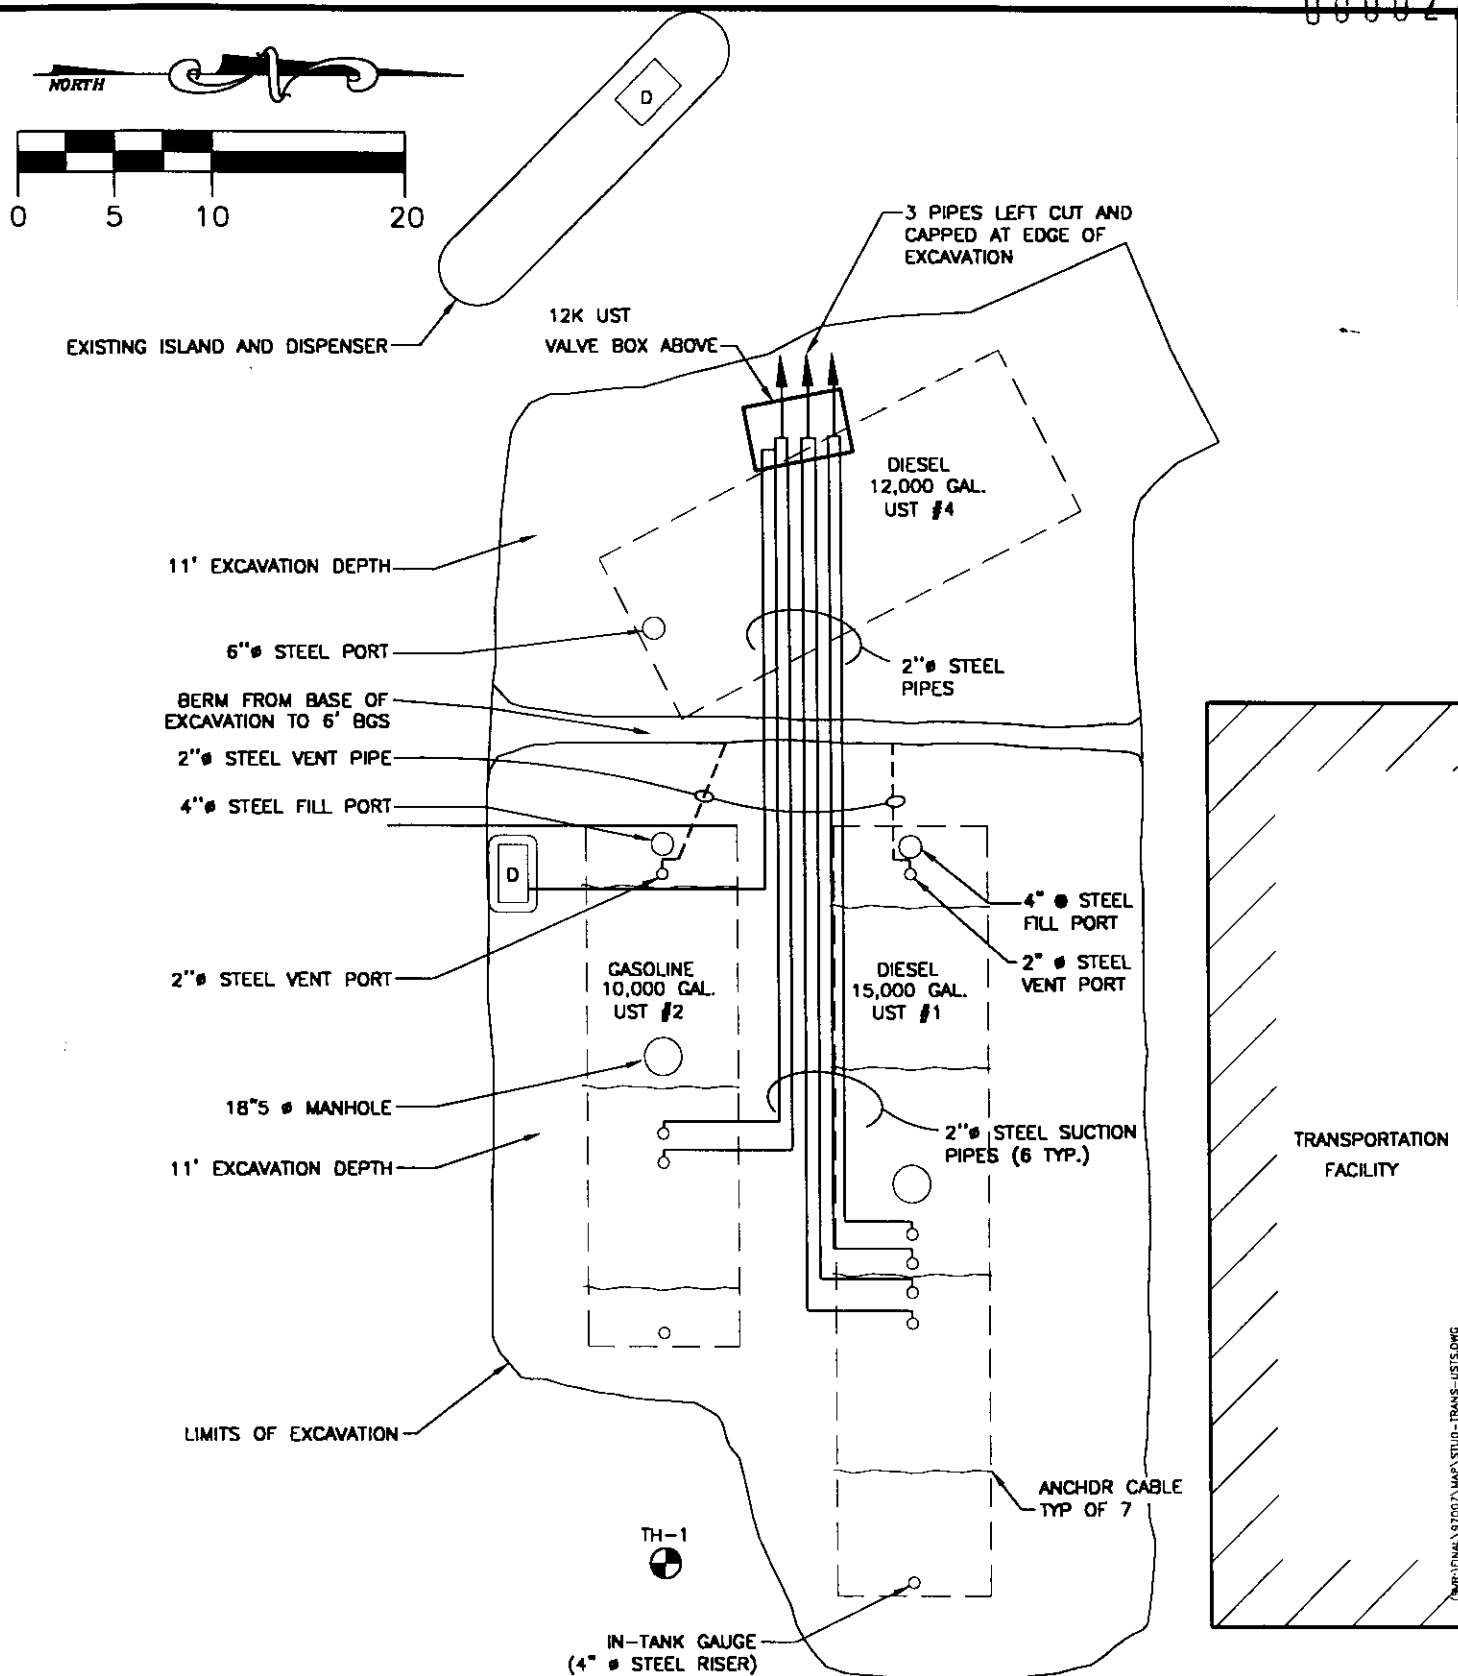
FIGURE III. UST # 1, 2, and 4 SITE PLAN
